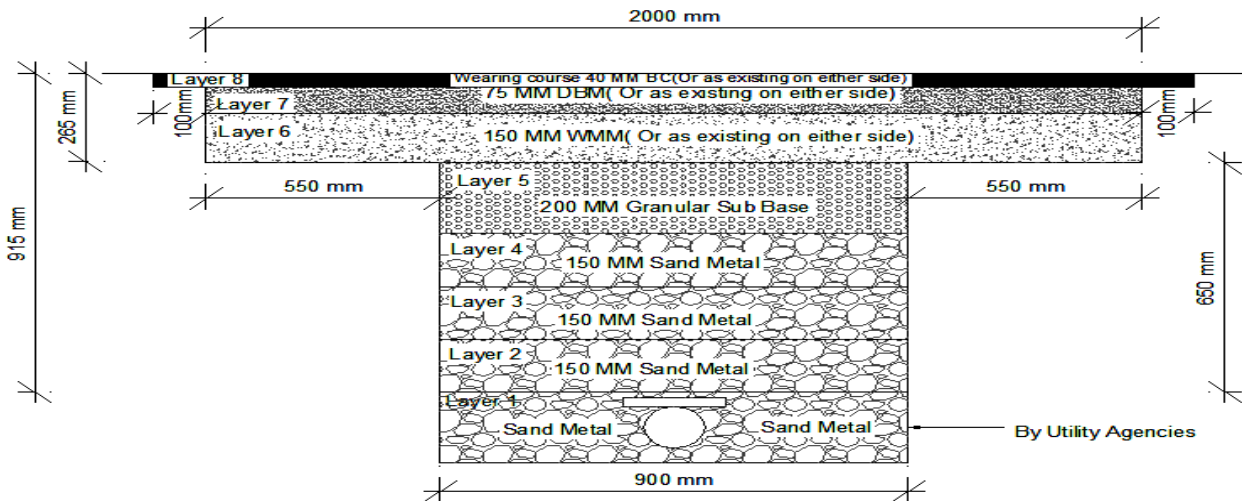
Typical Cross Section of Reinstatement of Trench
